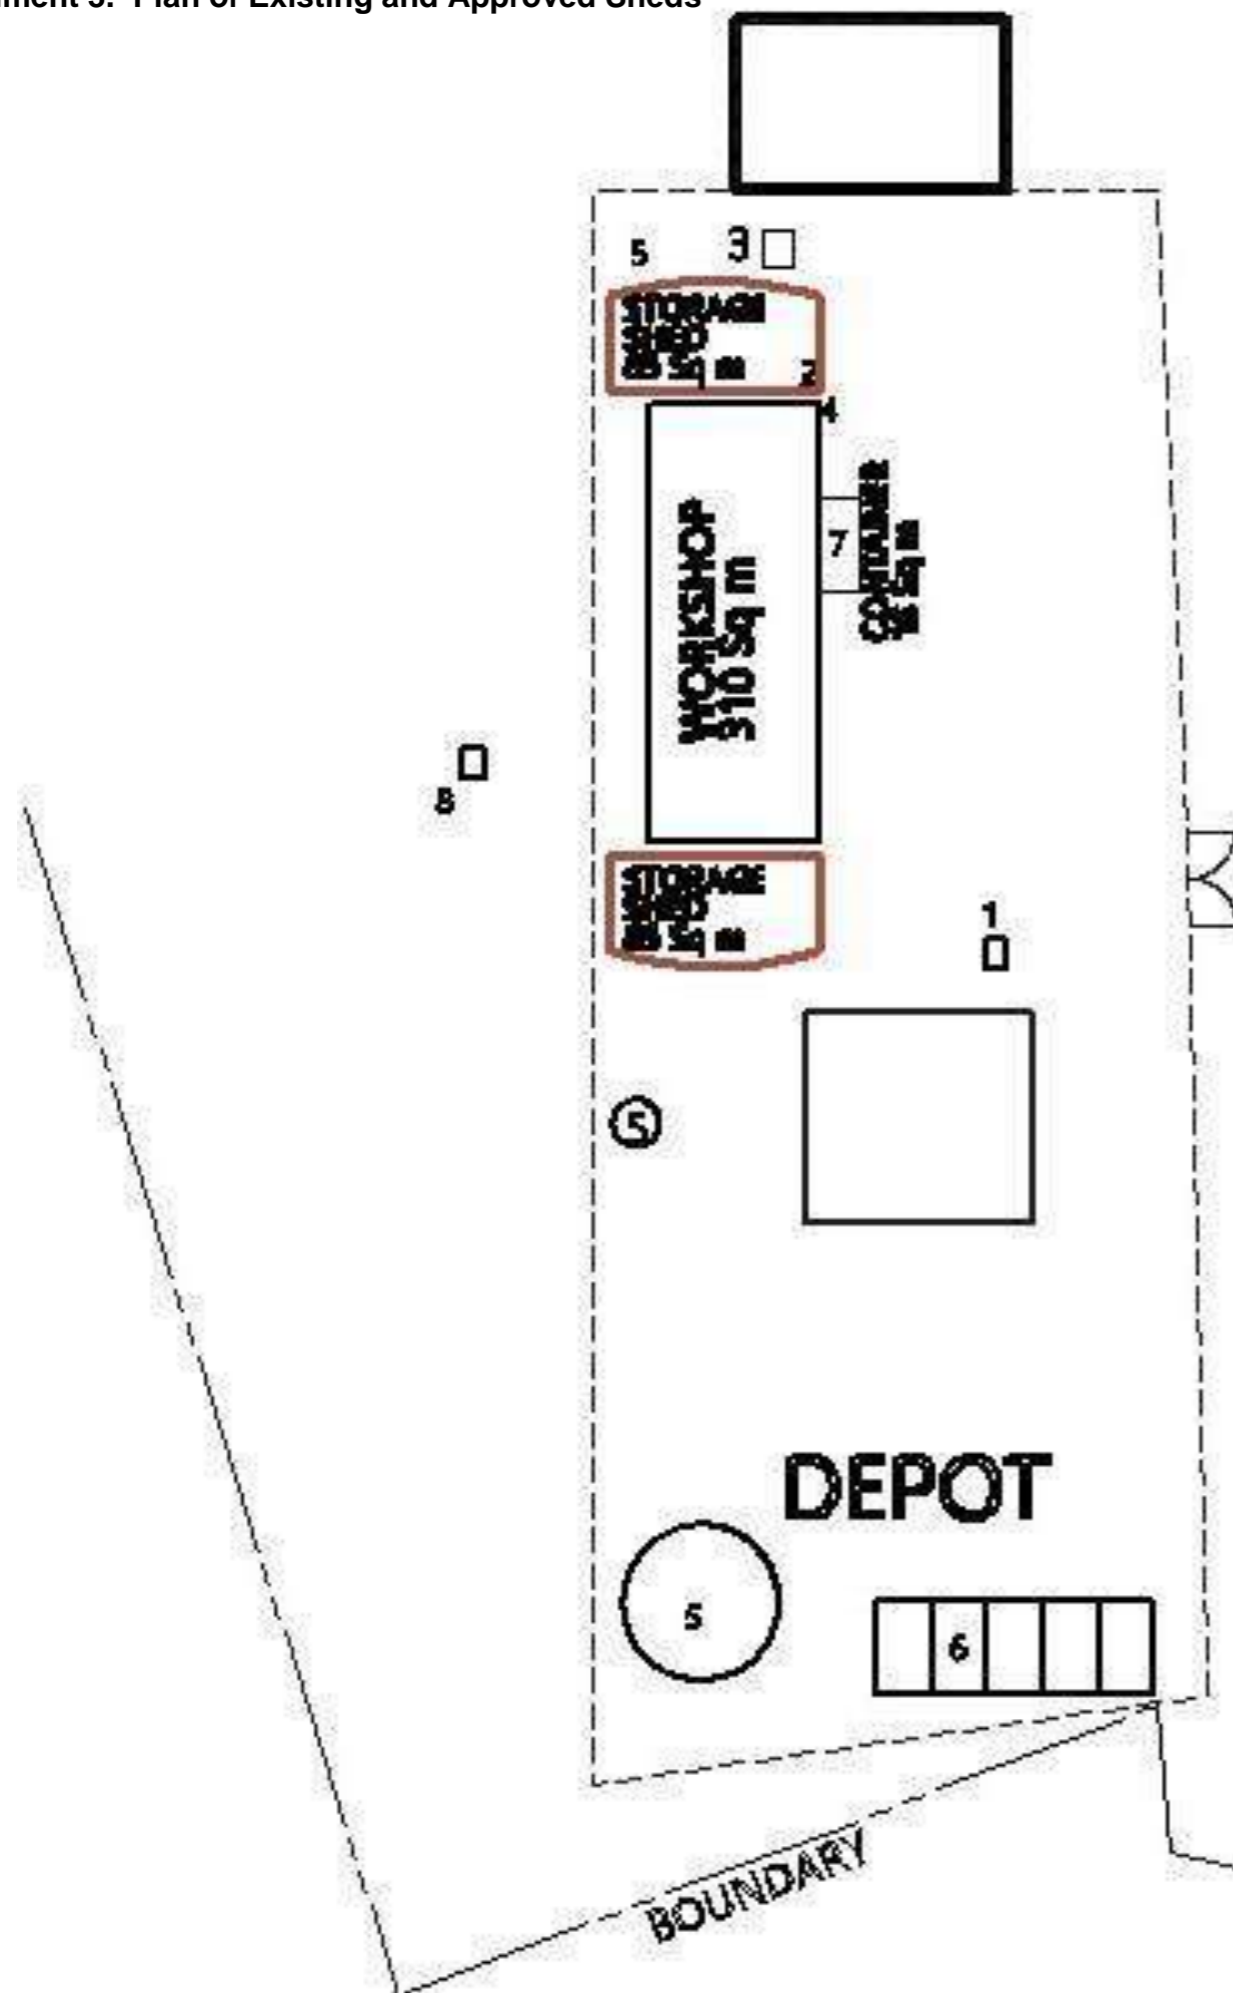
Plan of 177 Ridge Road Ashton following deposit of DA 13/950/473; also refer Attachment 2.
